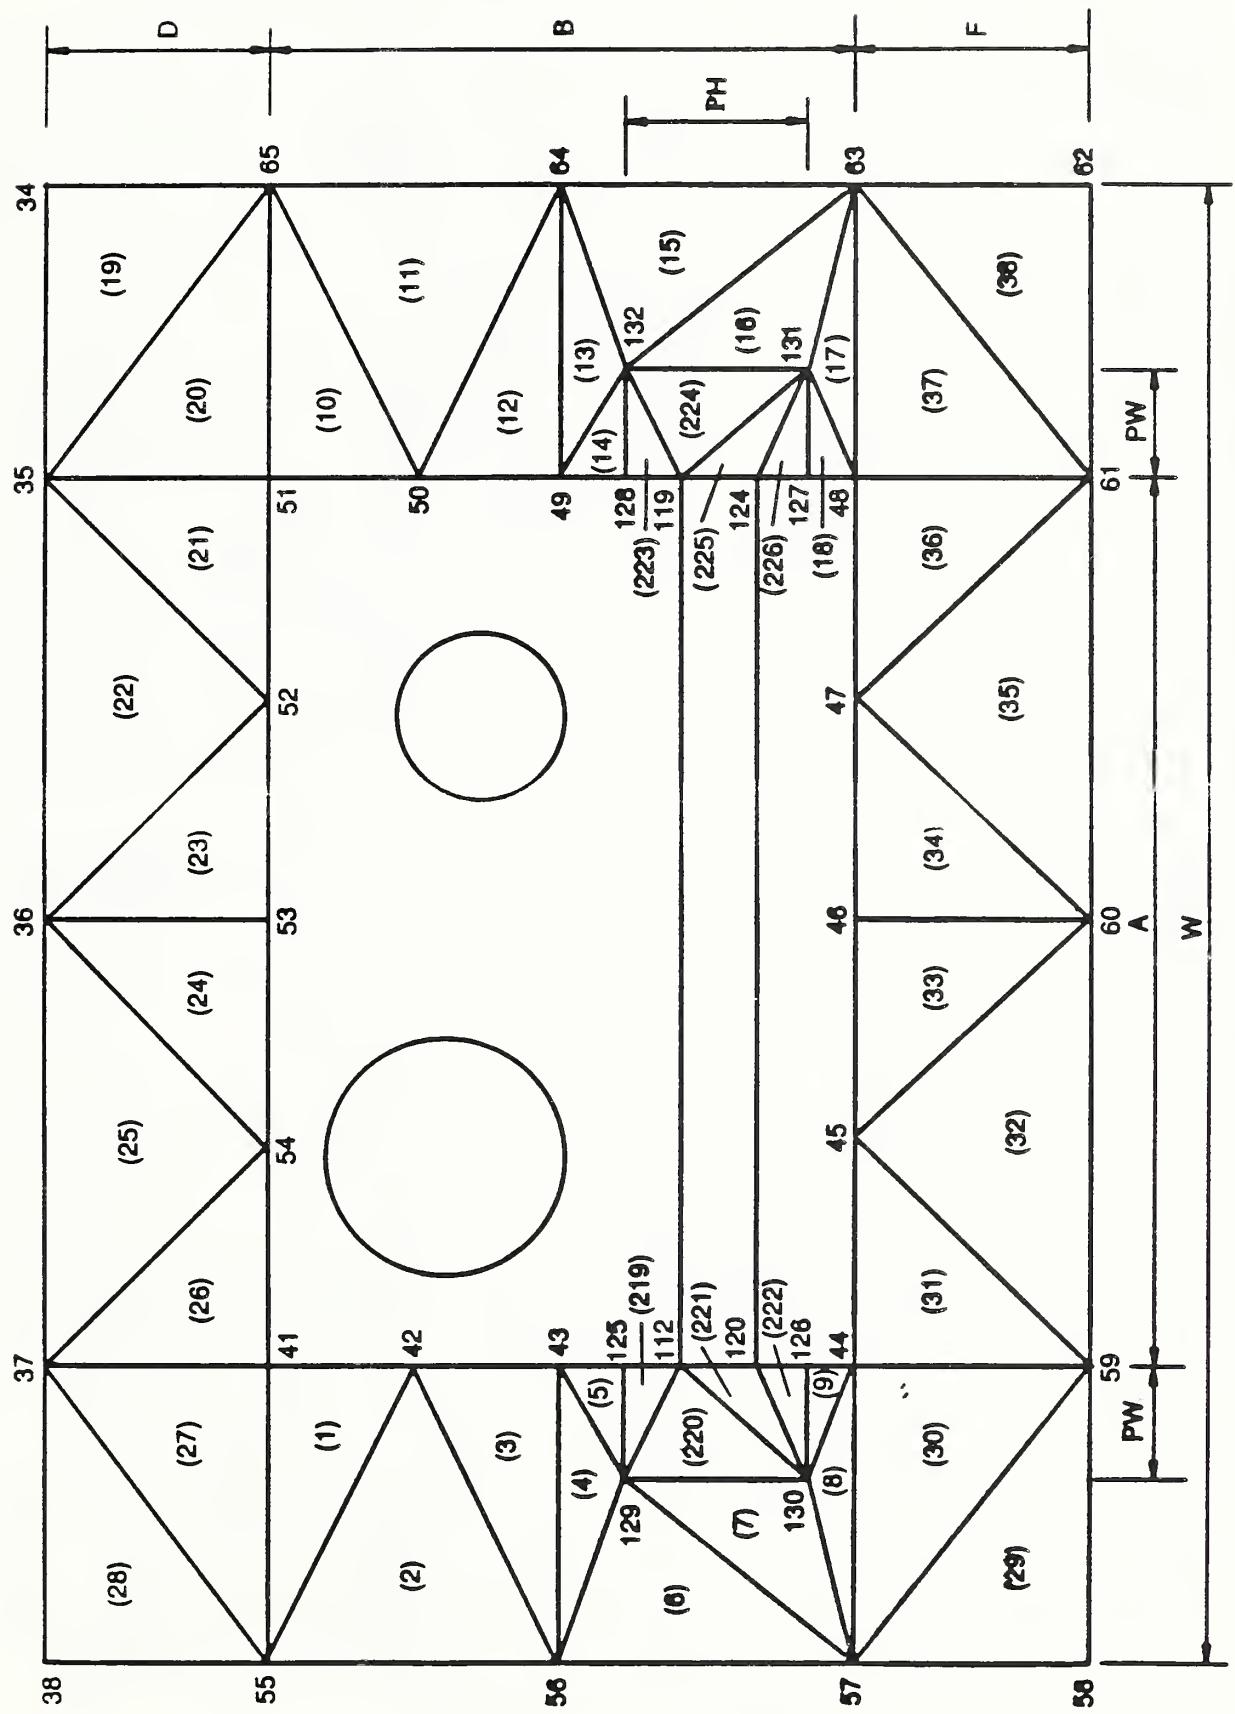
a Finite Element Design for Concrete Trench Walls, Floor and Cover, and Wall Plates for Vertical Piping Supports
